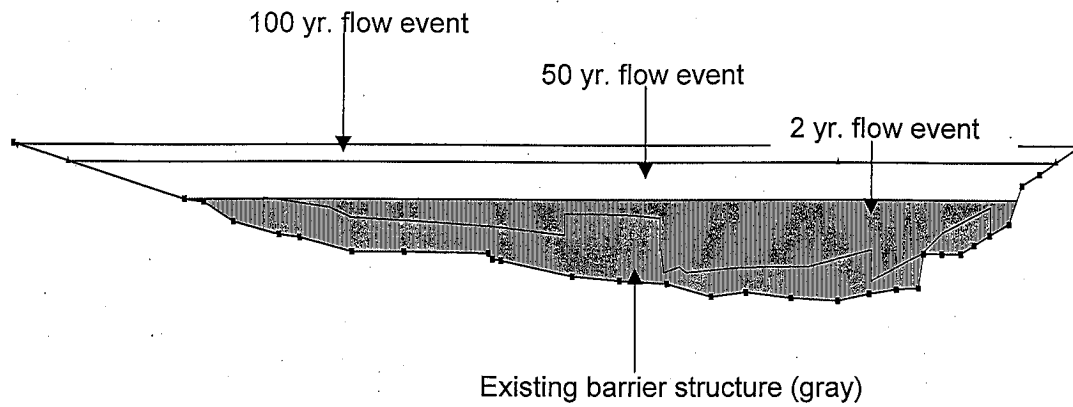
HEC-RAS modeled cross section of water surface elevations for existing barrier site conditions.
